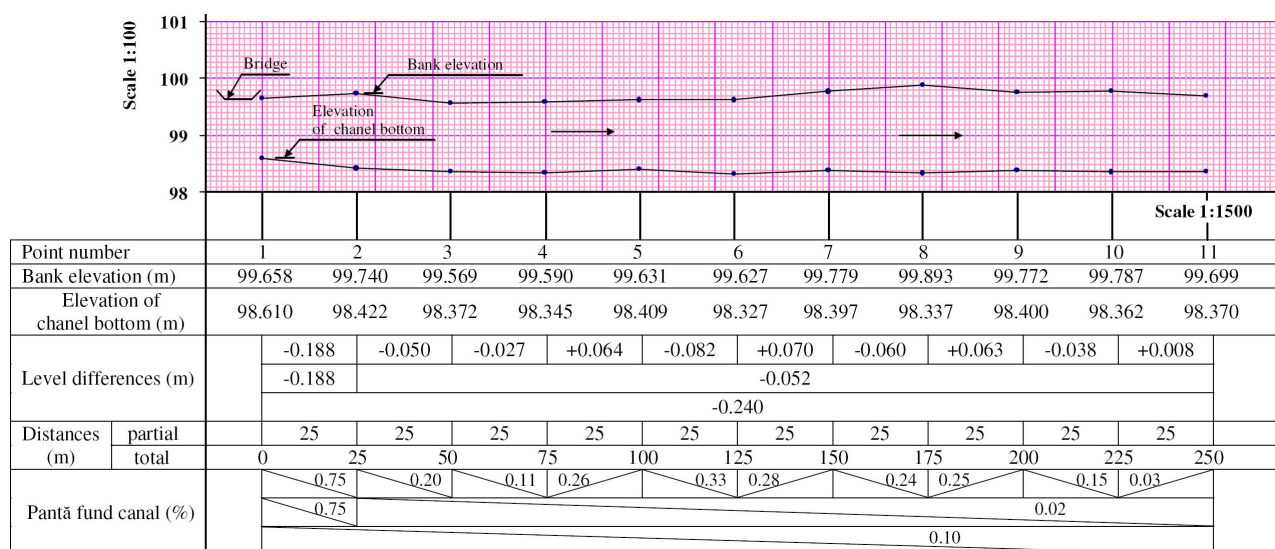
Longitudinal section on the CC₁ canal, downstream of the culvert
